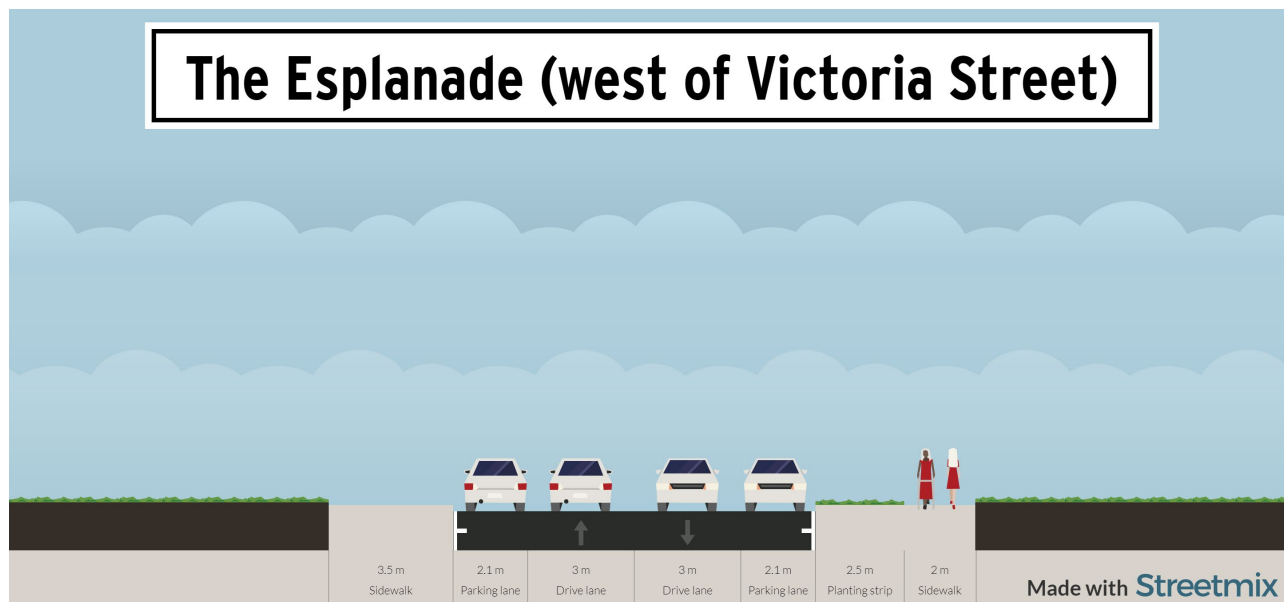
Stylised cross-section of the Esplanade – west of Victoria Street (source: Streetmix)
